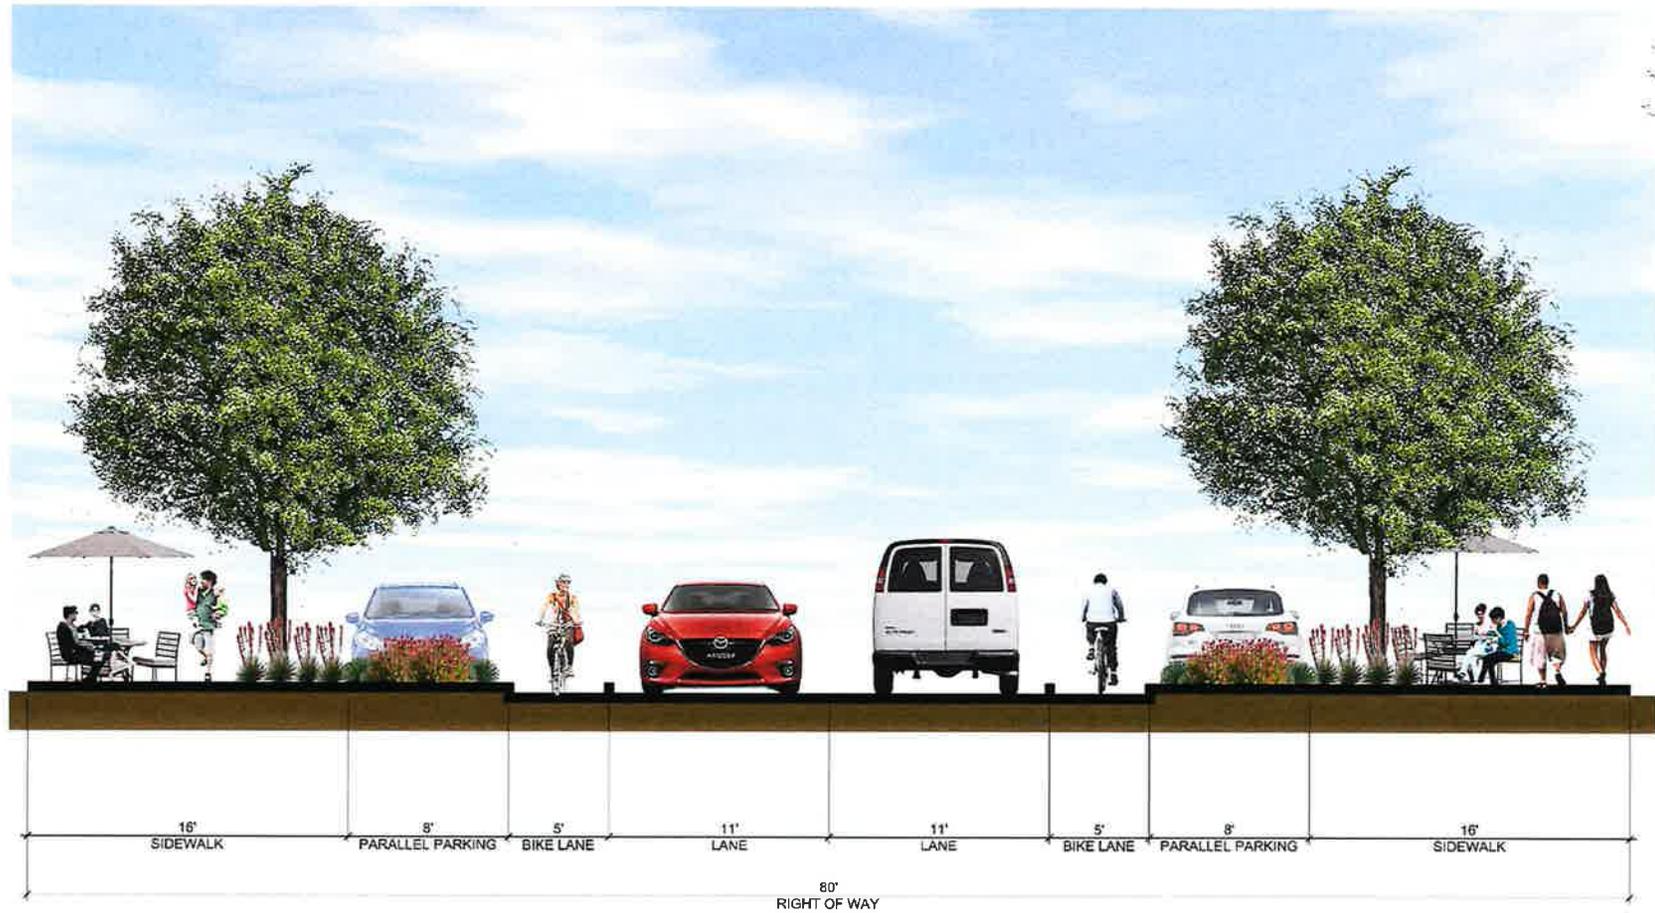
, Option 1 Santa Fe Avenue Looking Westbound from Bradford Avenue Cross Section
